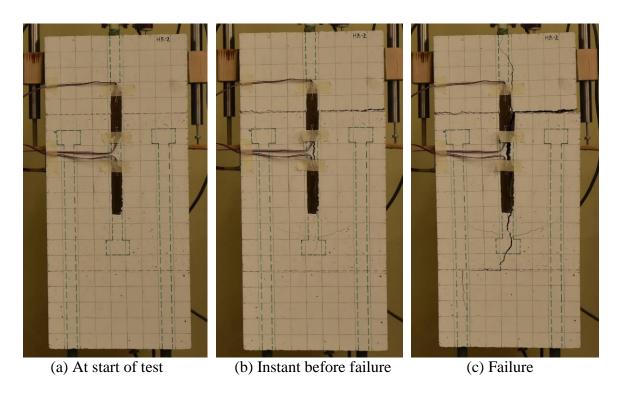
Pullout Specimen Before and After Failure – HB-2
